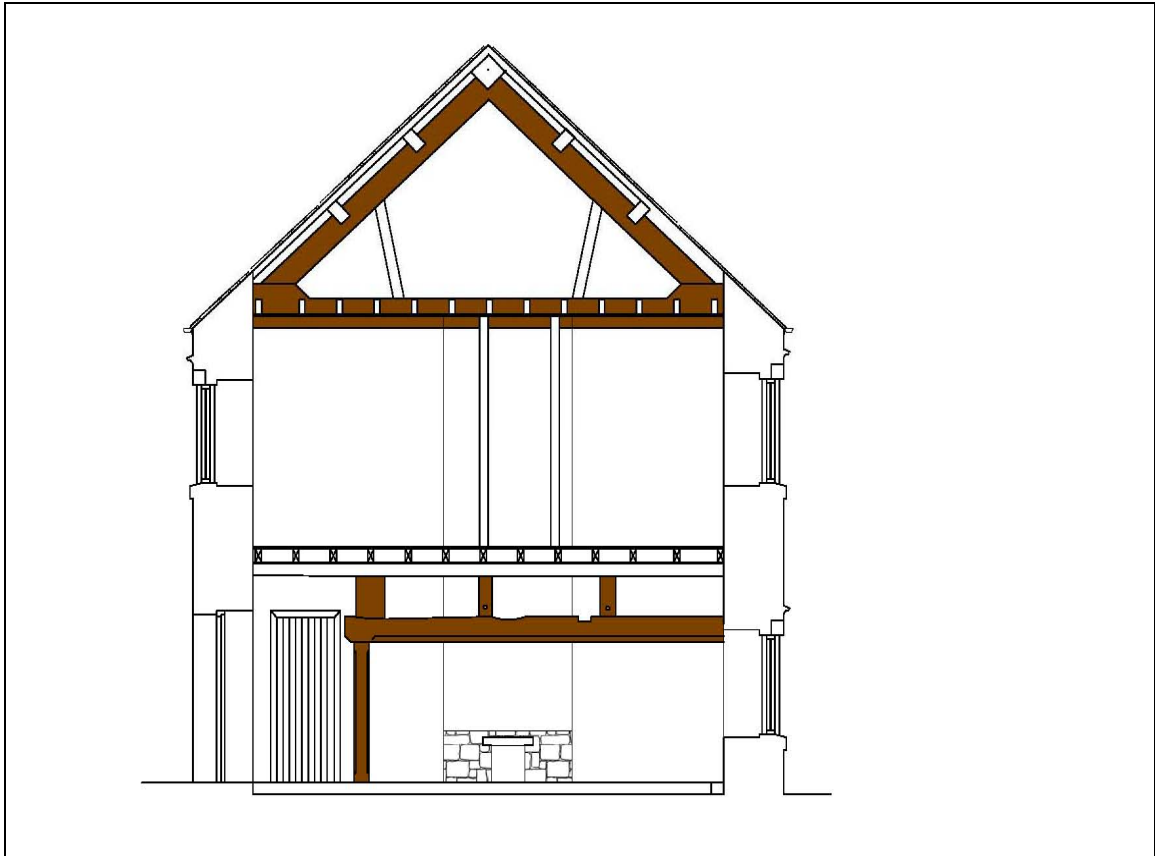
Section showing roof truss and firehood (Anthony Flanagan)
